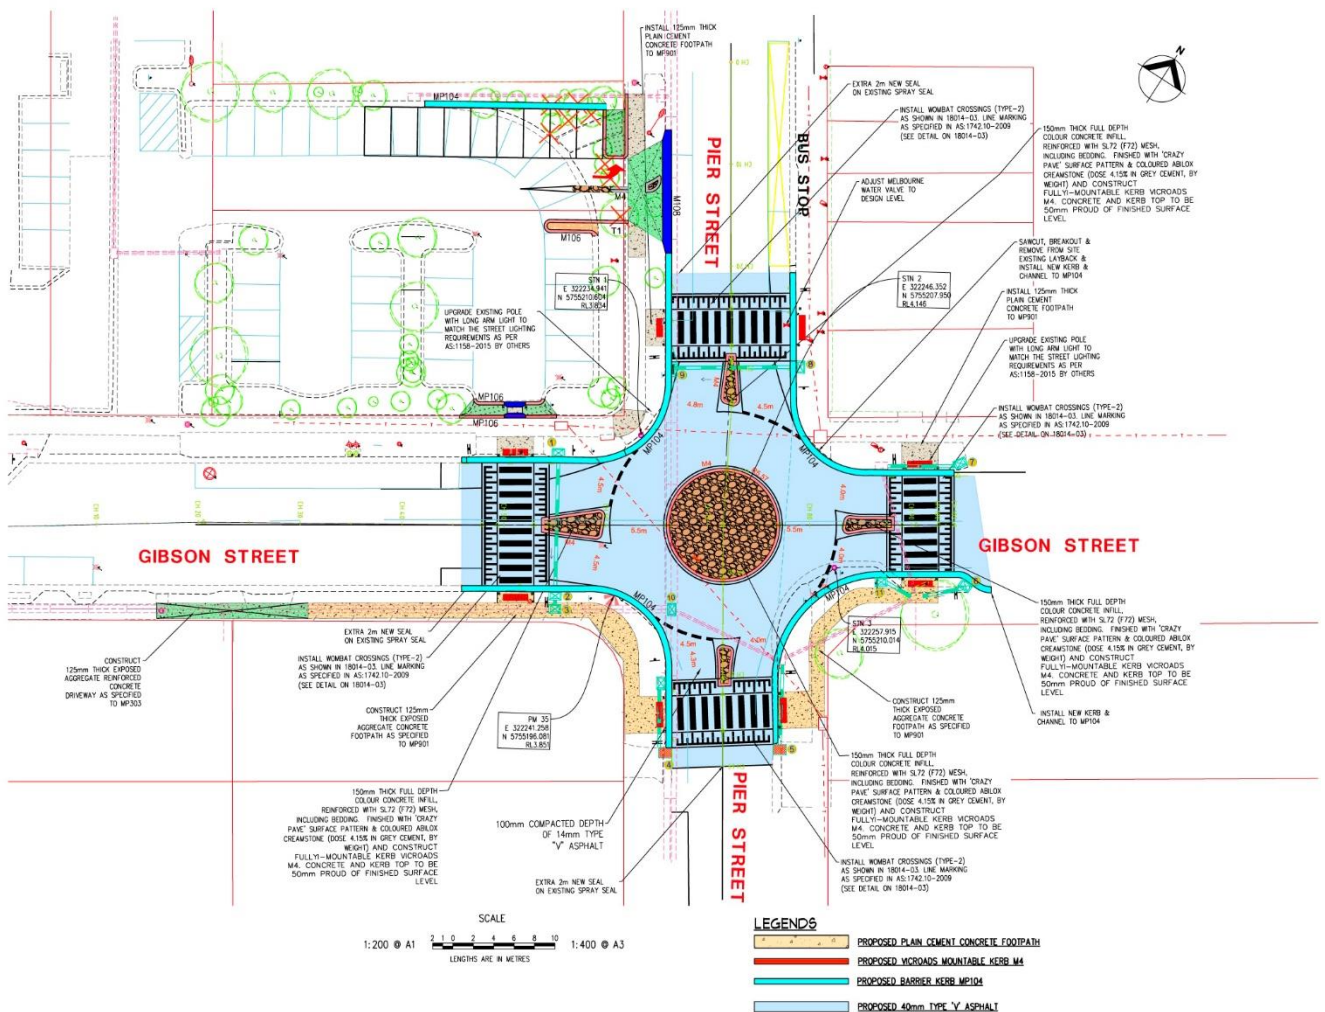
(e). Proposed compact roundabout for local residential road intersection, type 2.
